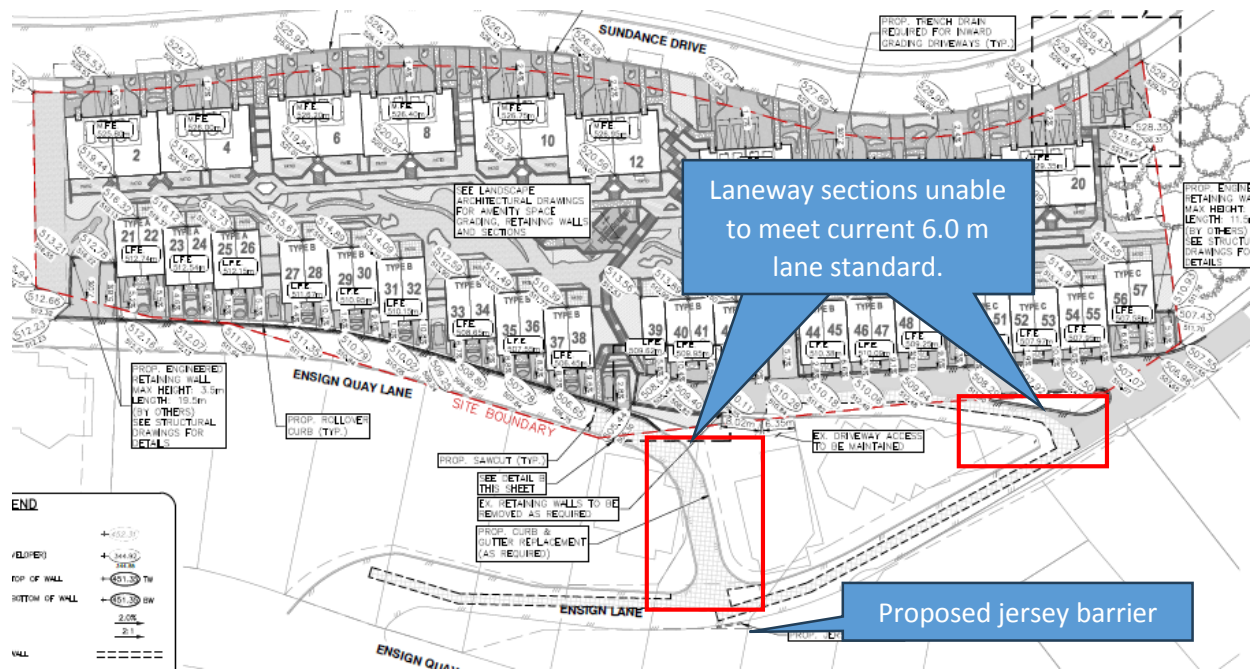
laneway improvements (i.e., widening and safety barrier)
